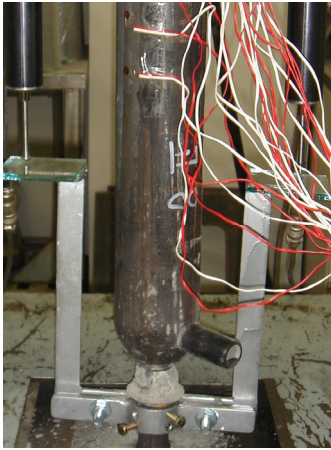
Final failure pattern (Specimen 37B2HM-1)
